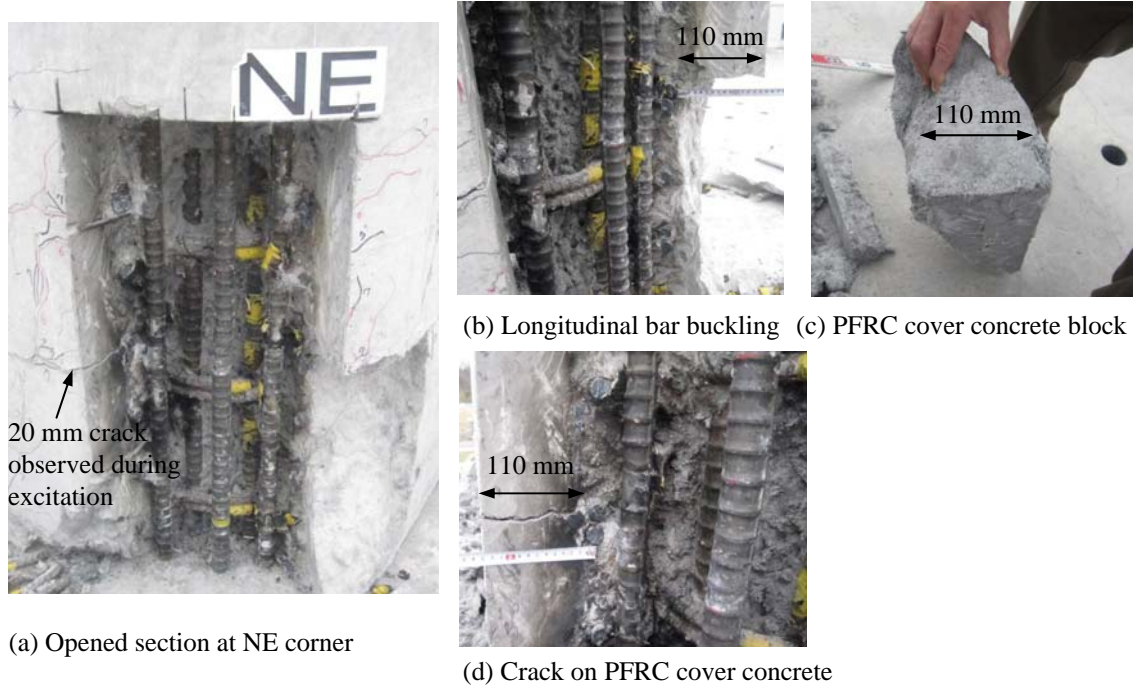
Damage of PFRC cover concrete and buckling of longitudinal bars at the NE corner after 2-125%(3) excitation
